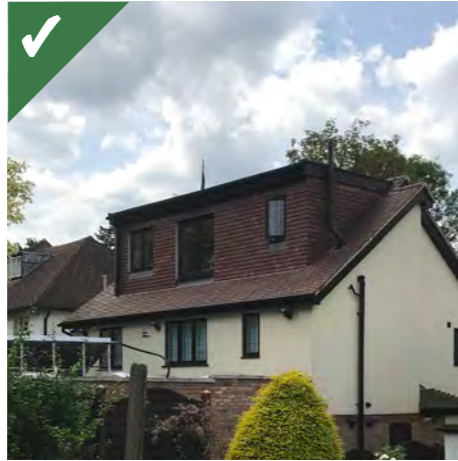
A good example of a dormer which integrates into the dwelling by successfully replicating the tiles and windows of the existing dwelling.
